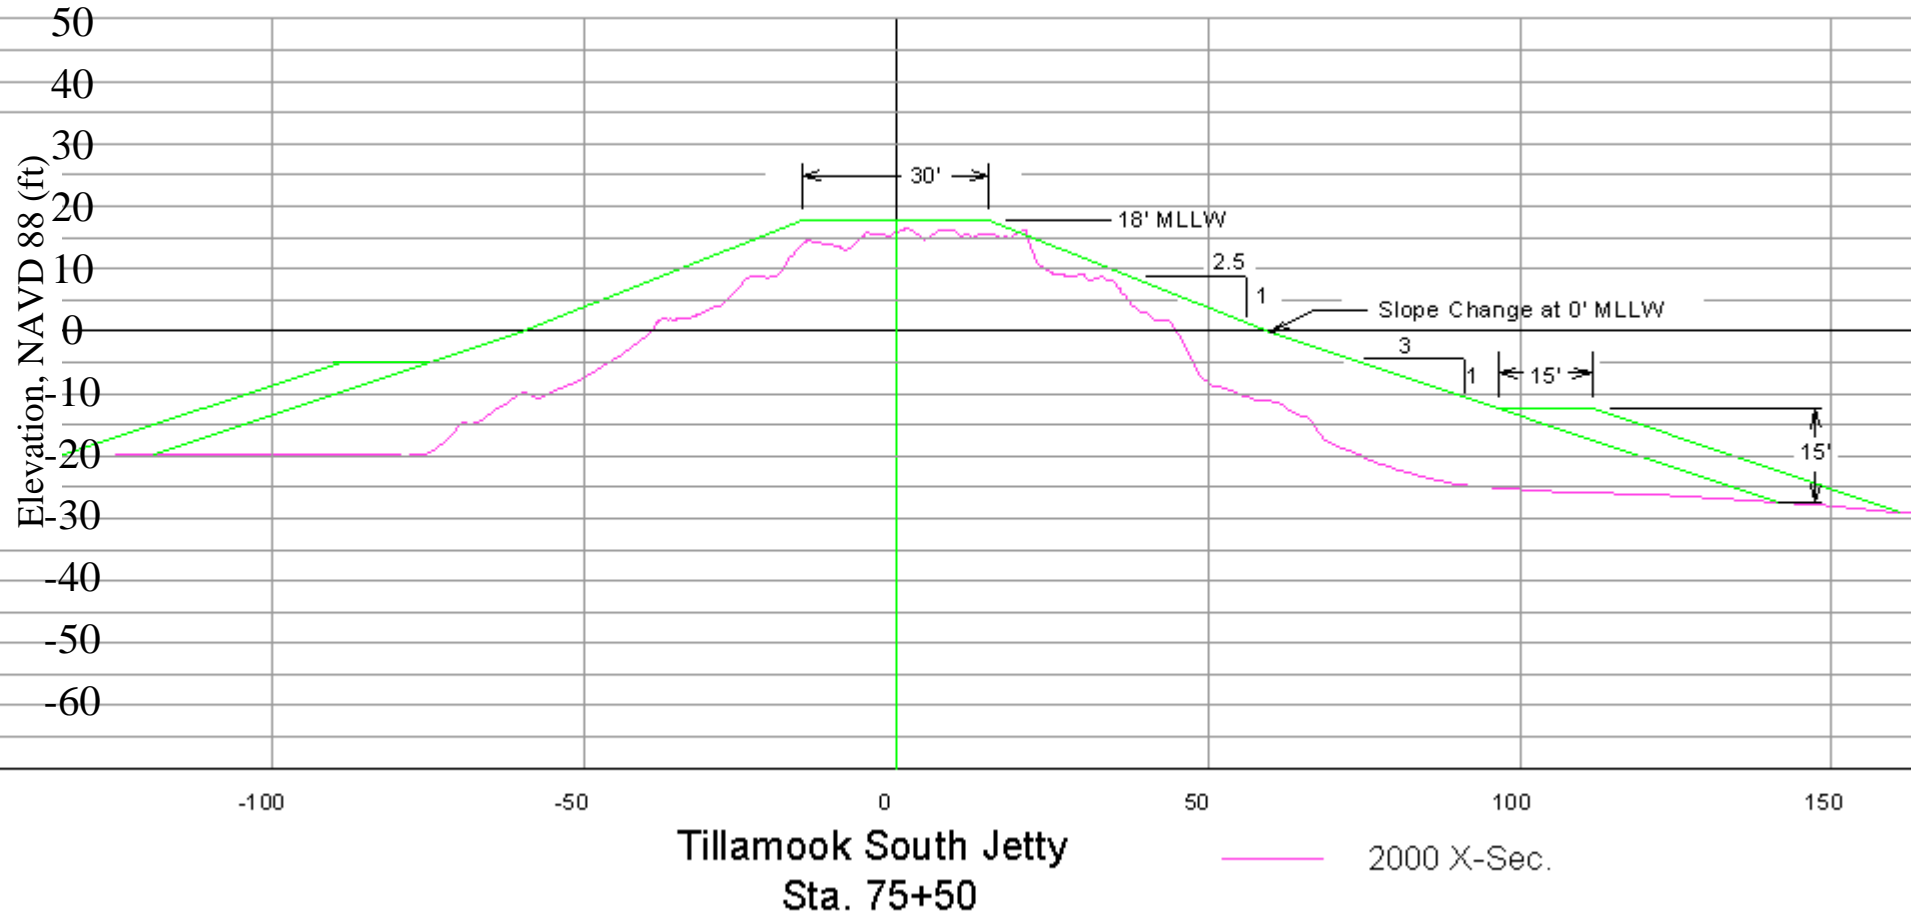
Typical Damage and Repair Design for South Jetty STA 74+00 to 77+00
